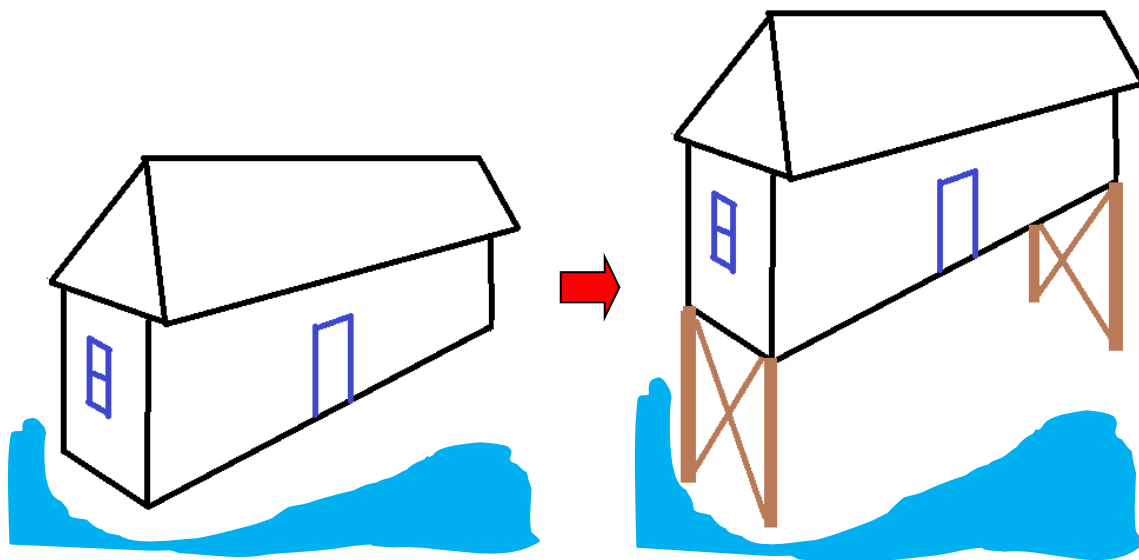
Building elevation by lifting foundation (Created by Author)
